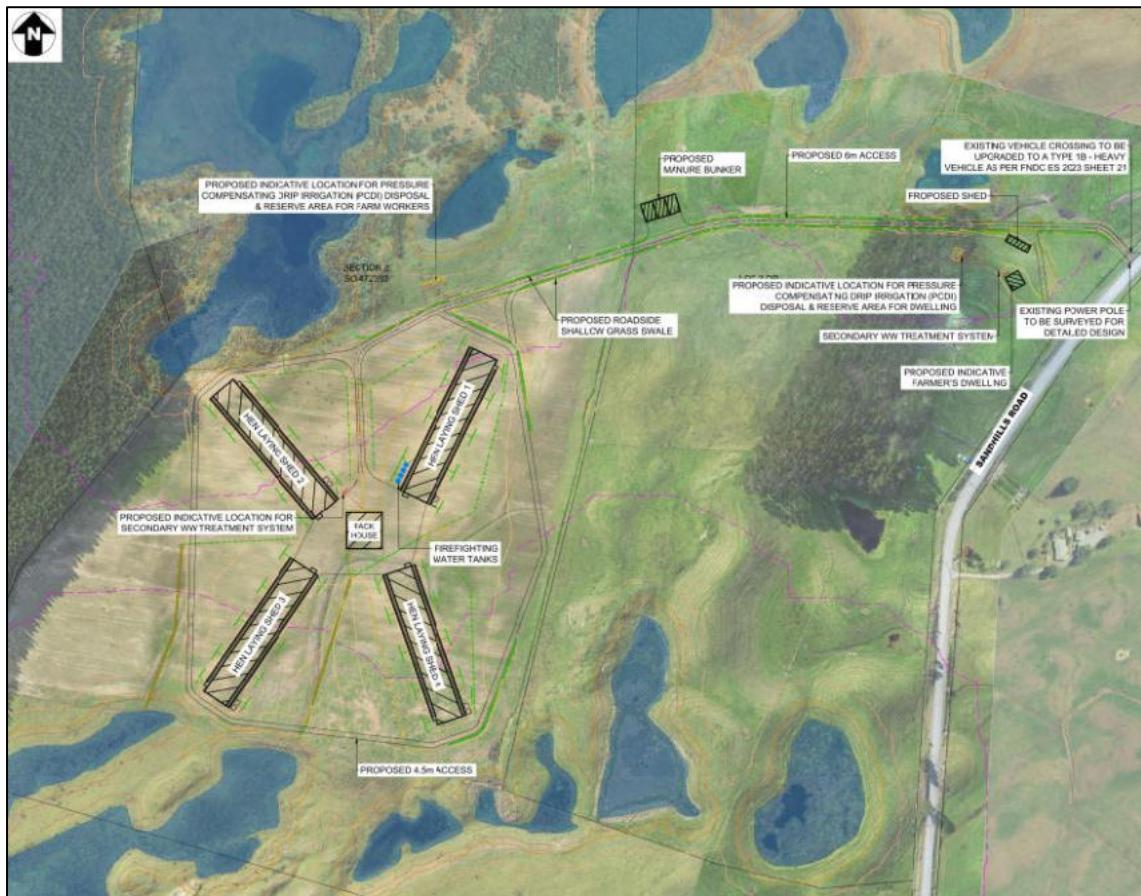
Proposed site plan (dated 10/12/2025)<sup>3,4</sup>.
